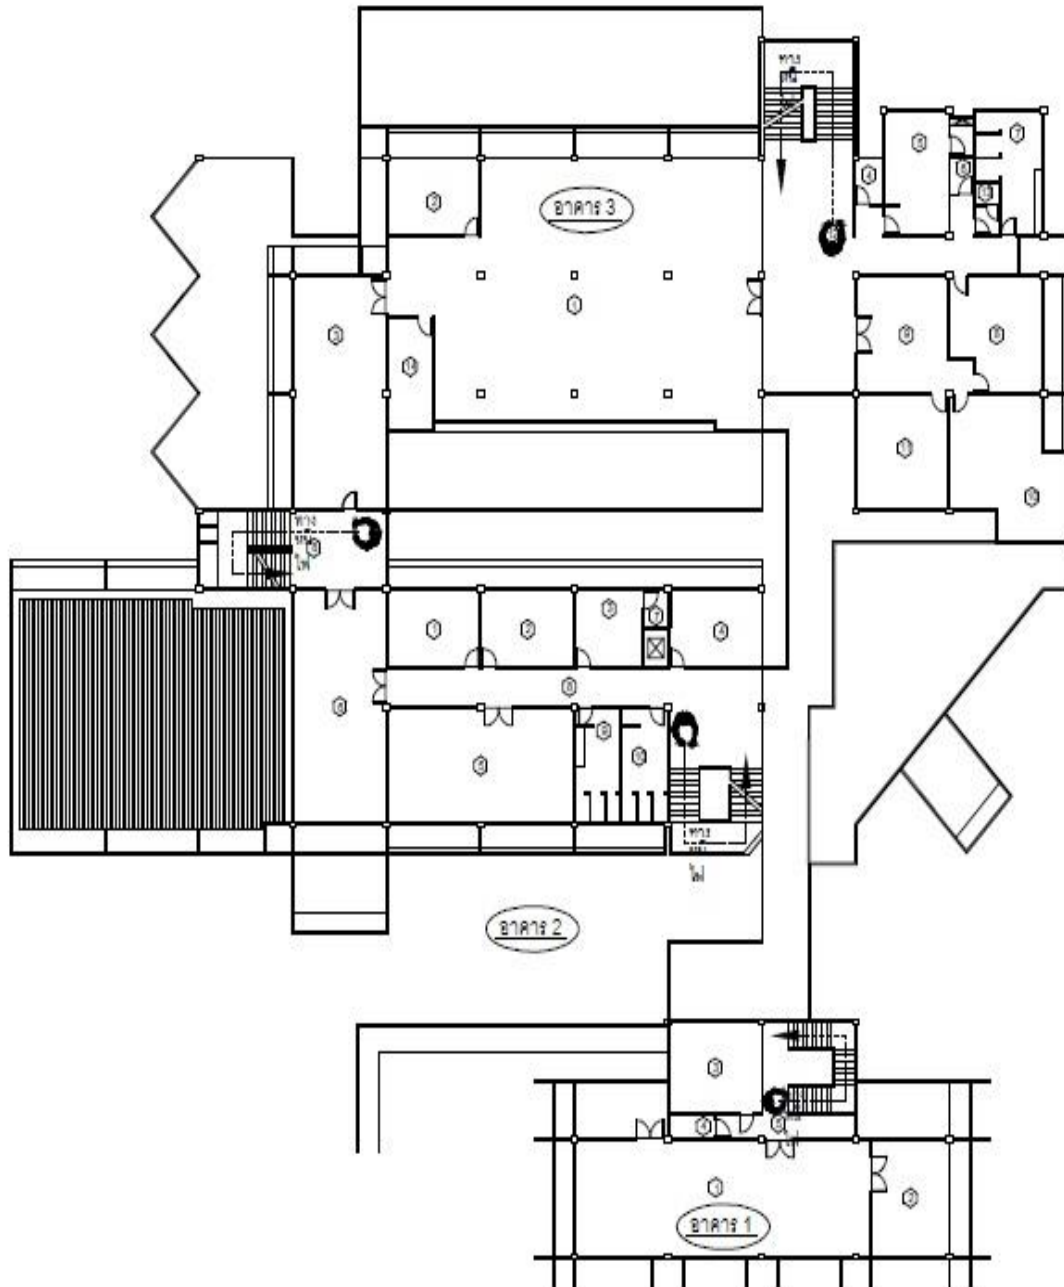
The 1<sup>st</sup> Floor of President's Office Buildings (Continued)
